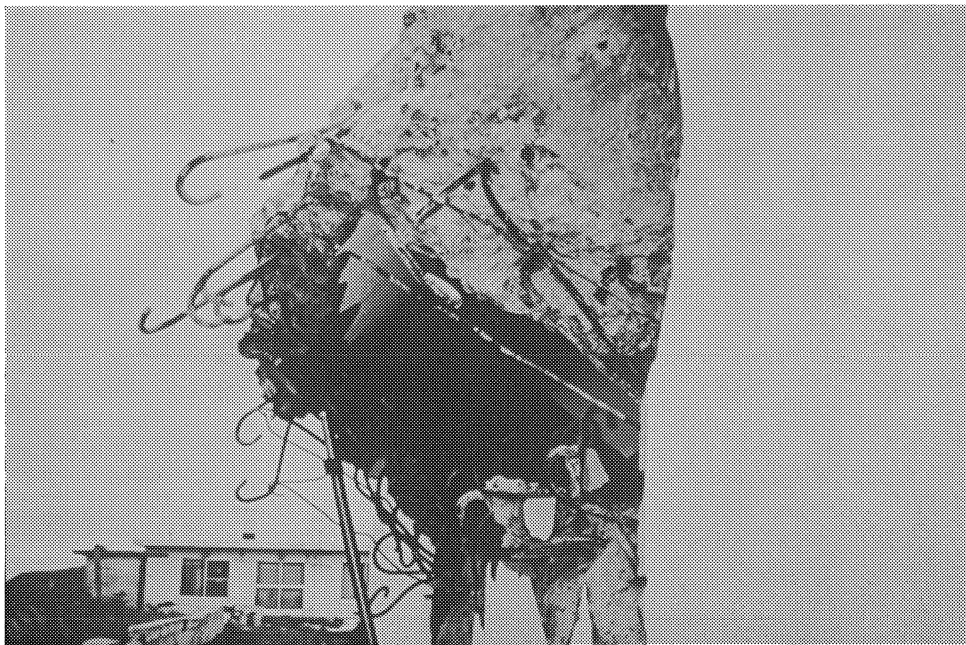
The Aonae lighthouse collapsed during the earthquake. The failure was caused by fracture of the tower structure at the base, along with pull-out of reinforcing steel dowels from the foundation. The inspection indicated an apparent bond failure of plain J anchorage bars (approximately 24 mm in diameter).
